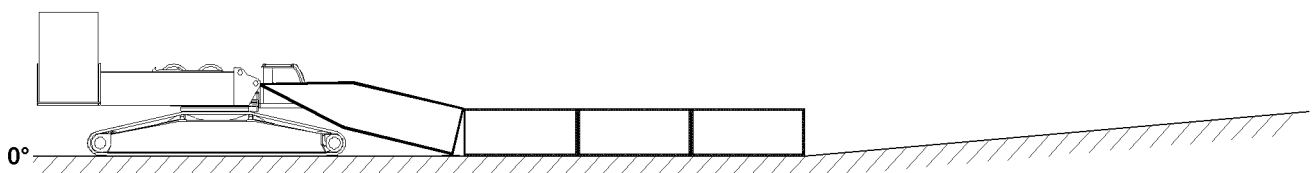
Disassemble and remove the boom - intermediate sections with the end section
